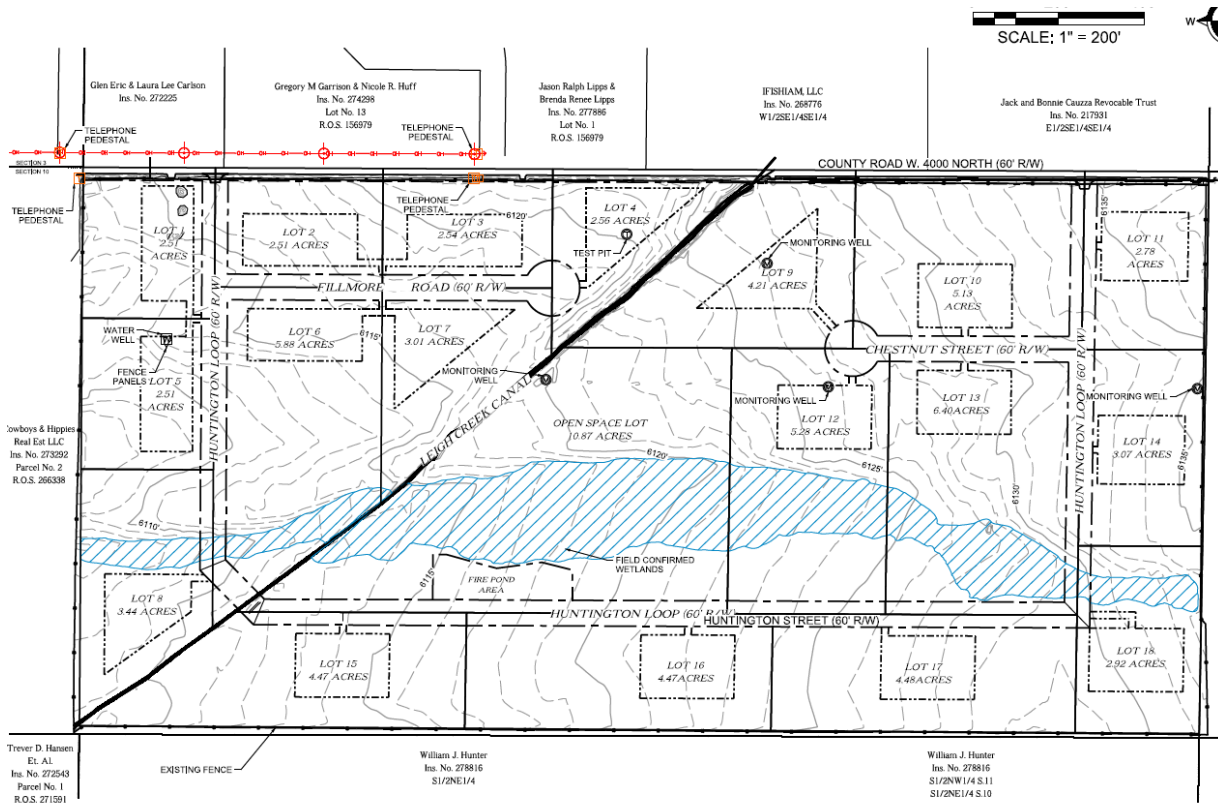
Updated preliminary plat (layout still used from updated improvement plans)
